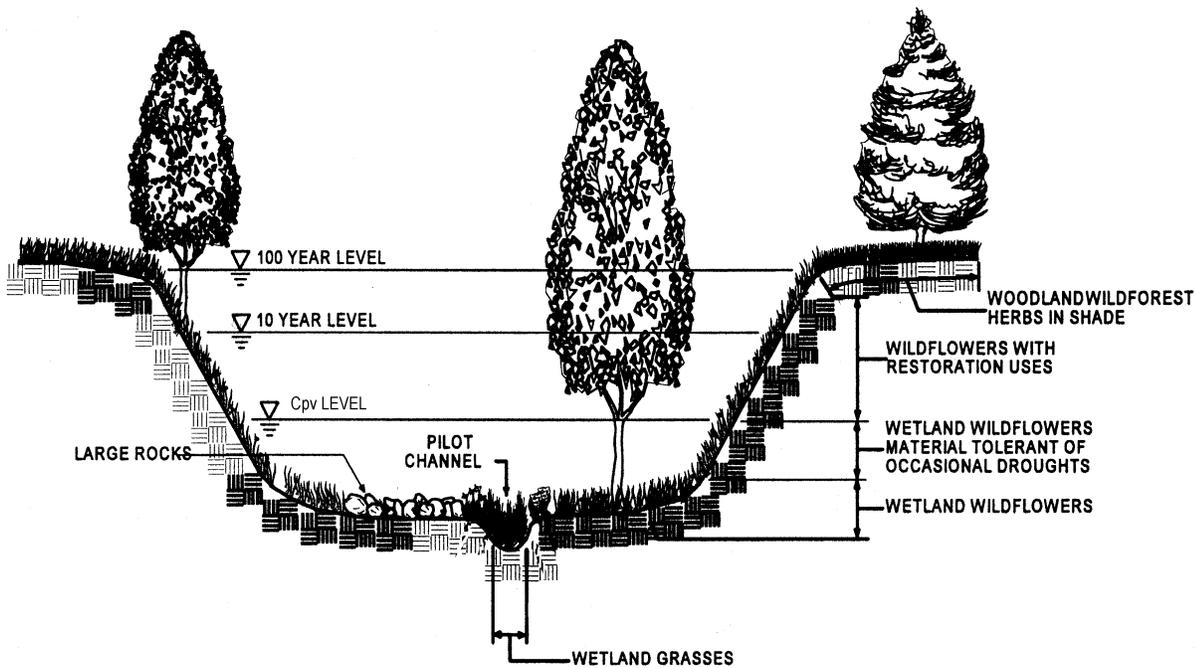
Schematic Section of Typical Stormwater Management Detention Pond
